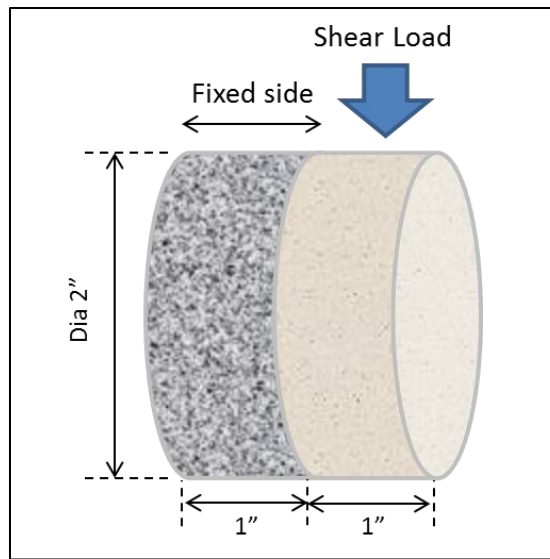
Schematic drawing of the shear bond tester using cylindrical composite cores.
